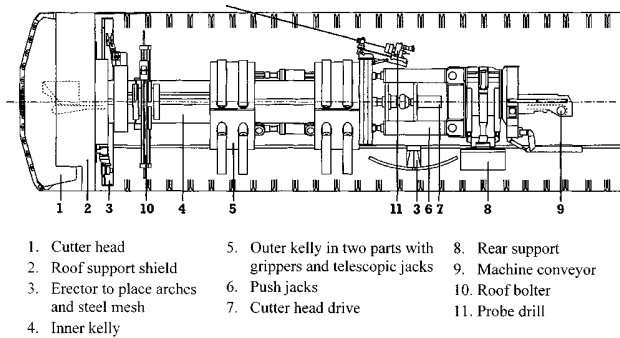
Gripper tunnel boring machine schematic (courtesy of Wirth GmbH)
